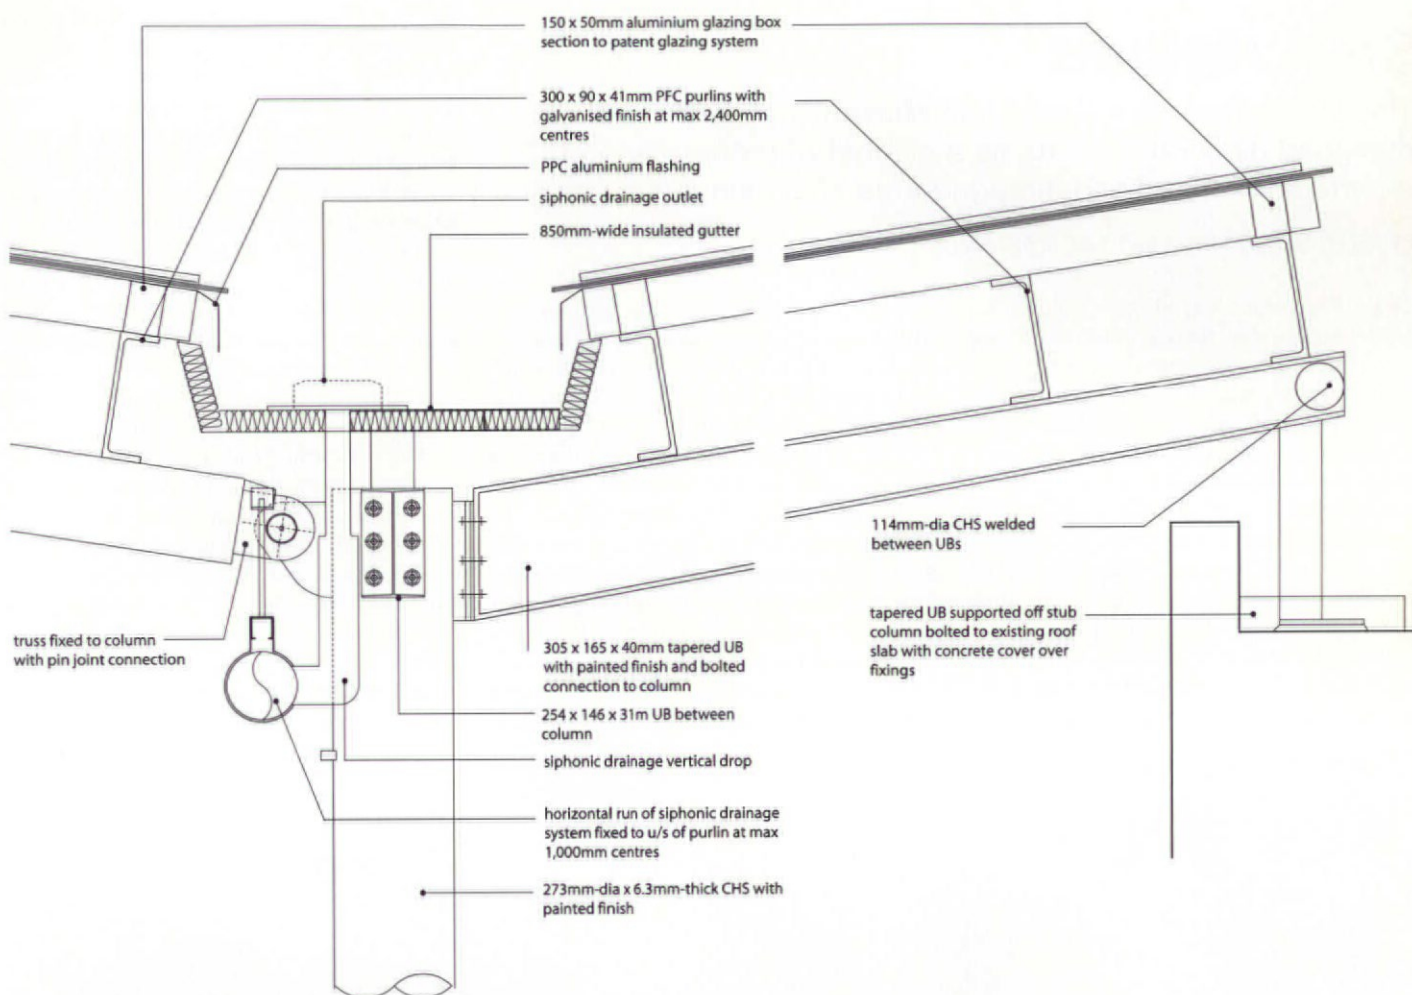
DETAIL SECTION AT CONNECTION OF CANOPY TO NEW BUILDING
